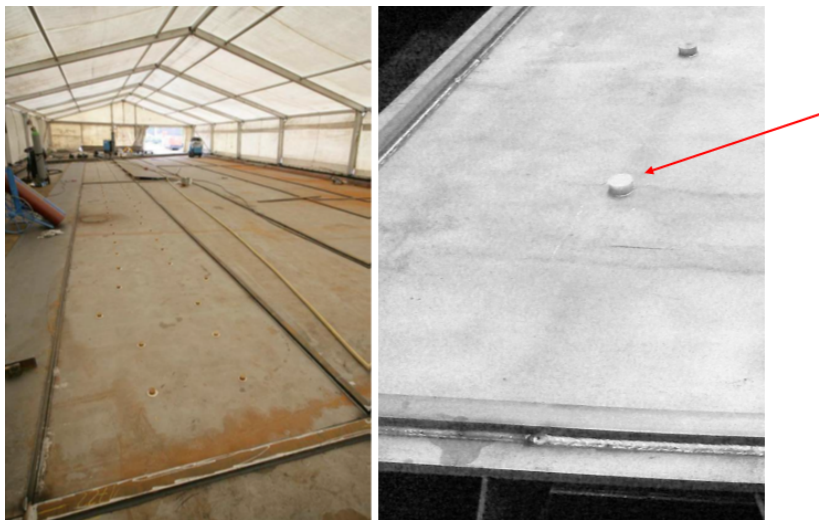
(a) A layout grid has been prepared, the perimeter bars are welded and the elastomer spacers are glued onto the bottom steel faceplate. (b) Elastomer spacers to equal the space of the faceplates during installation - Source:
